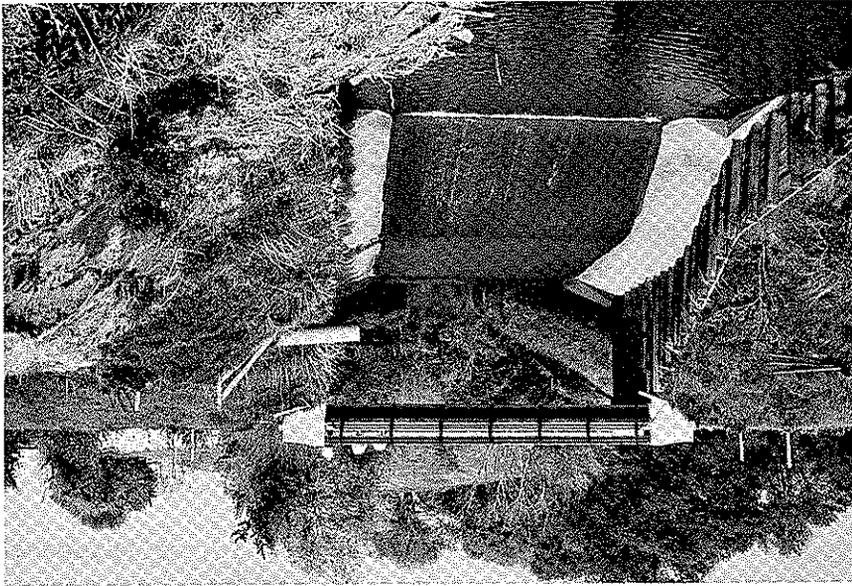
An SCS-type drop inlet for a grade stabilization structure. Note baffle plate to disrupt vortices and trash rack.
